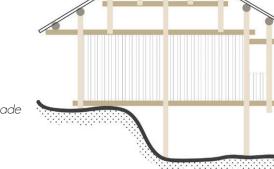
Dwellings of Xiayan Stockade in Jianhe, half stilt house
